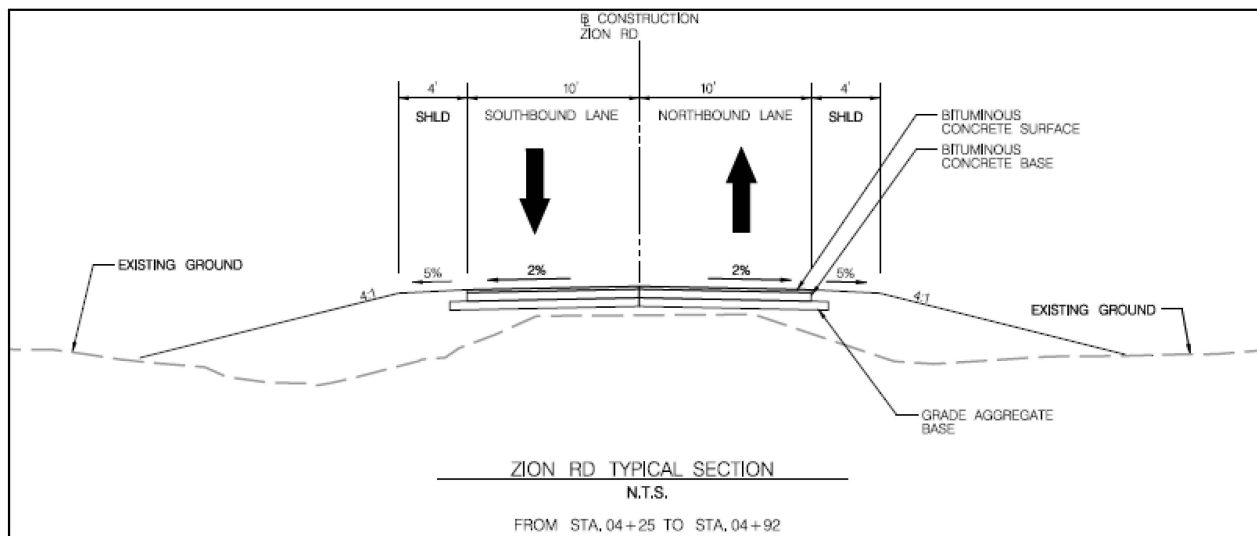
Cross Section for Bridge Approach (Shoulder with Gradual Slopes)
